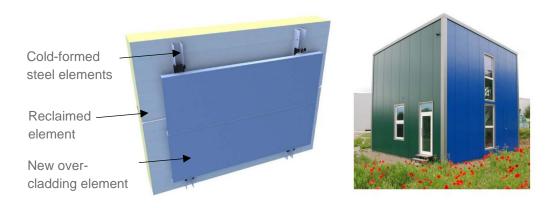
Over-cladding sandwich panel construction (RWTH Aachen)
